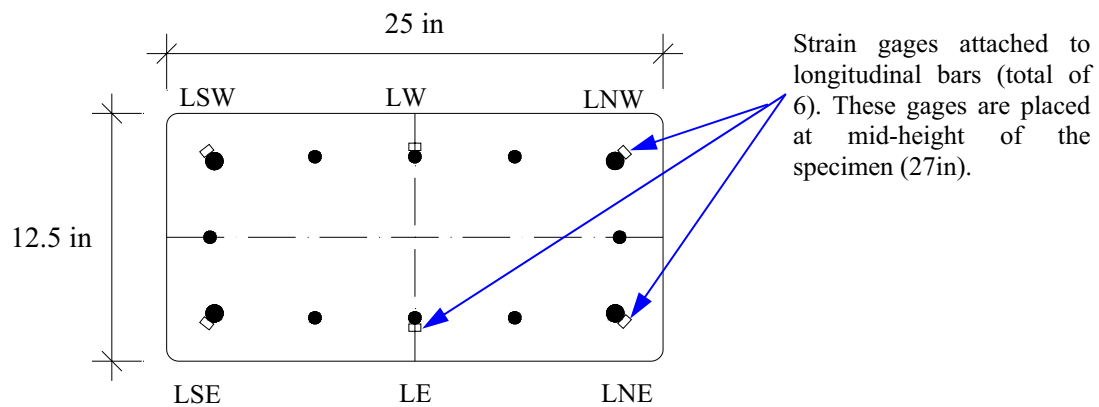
Section B-B; Strain Gage Location on Longitudinal Steel; Specimens B1, B2 & B3
